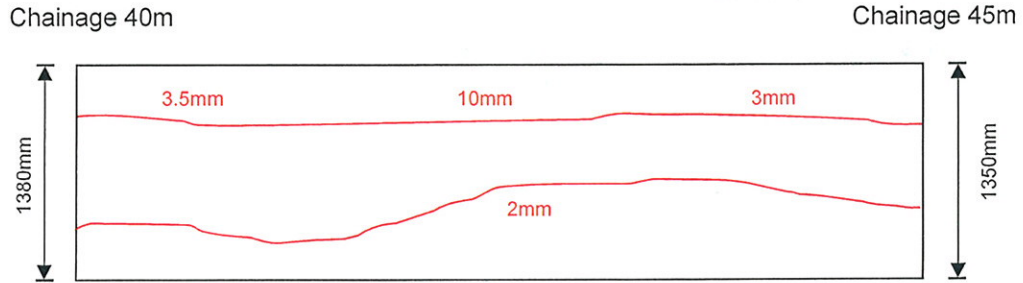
Wall Height, Crack Locations and Sizes for Chainages 40m to 45m
